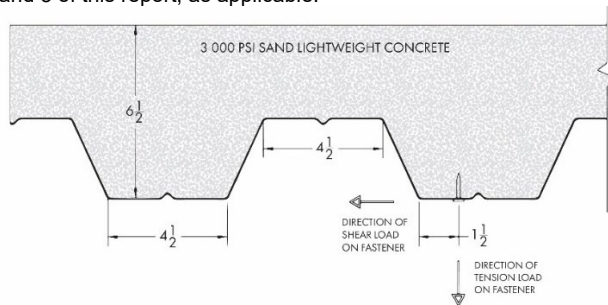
A—FASTENER INSTALLATION IN 3-INCH-DEEP STEEL DECK
